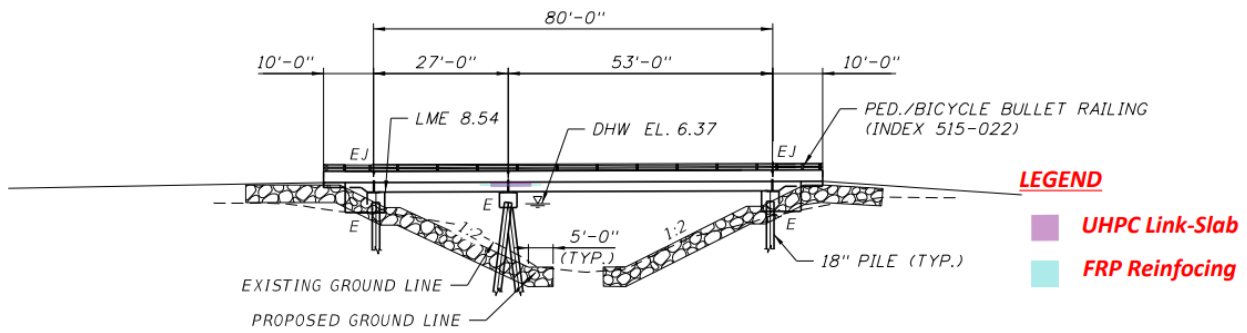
Longitudinal Section Detail of the link-slab (Bridge No. 019003)
